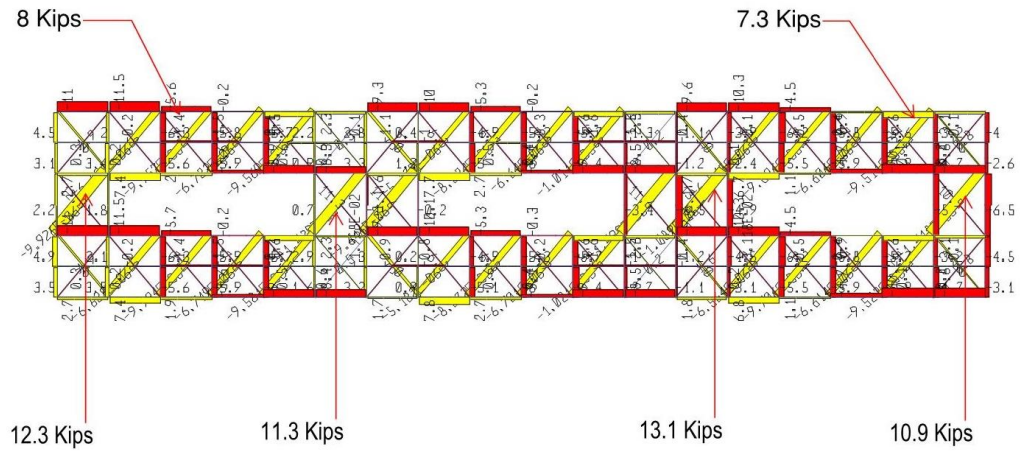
Case 4, 24-story braced frame with x-rod braced structural cladding. Elevation diagram of typical floor (Level 16) showing stresses under wind load. (HOK).
